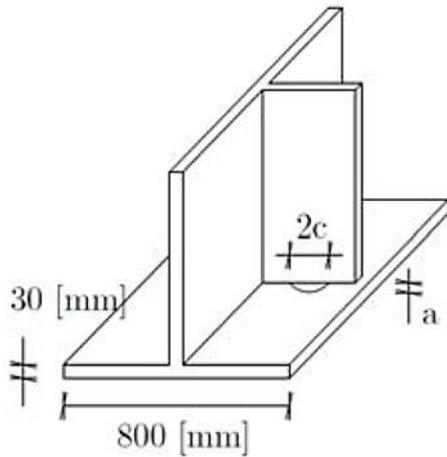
A welded connection between a web stiffener and girder's flange of a bridge (Lukic and Cremona, 2001)
